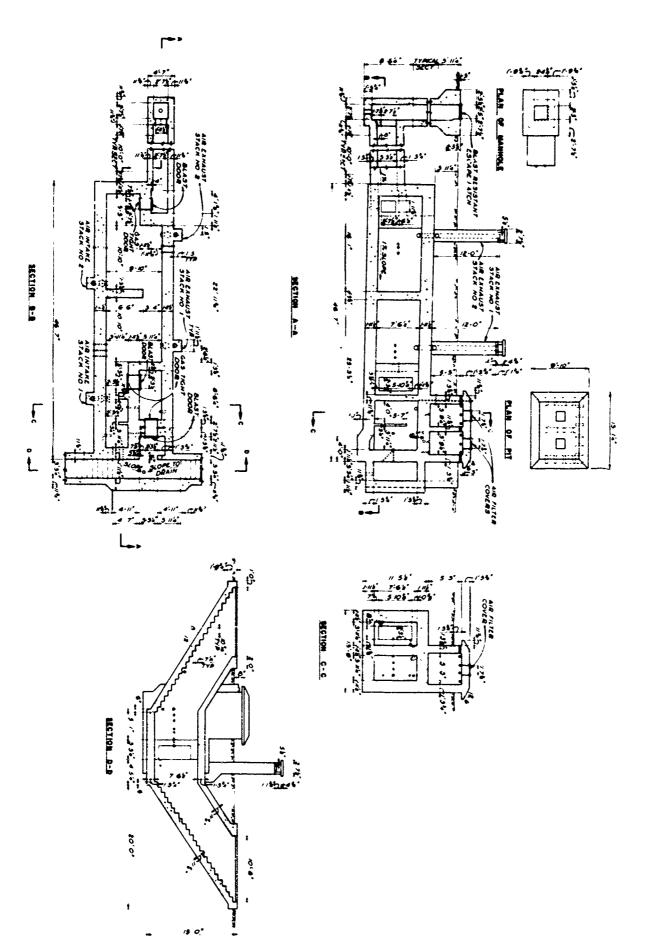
Rectangular shelter, type 60, structure II-1, architectural layout.
